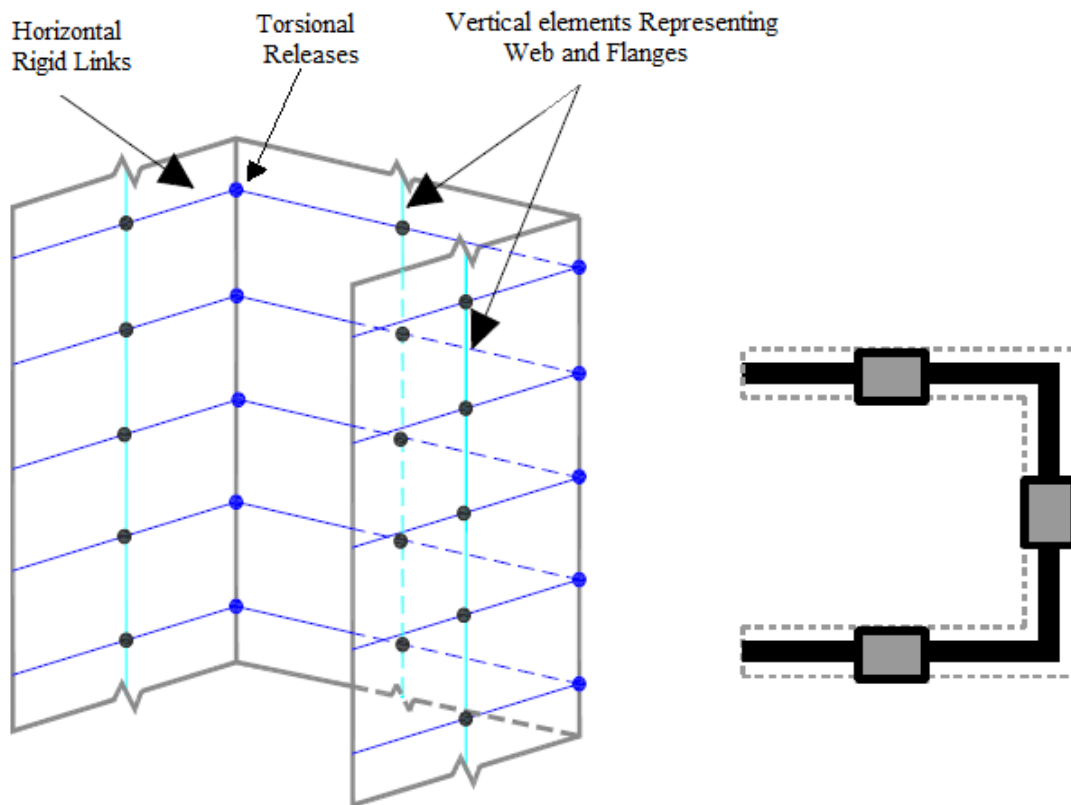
Model scheme used to represent U-shape wall system (Beyer *et al.* 2008)
